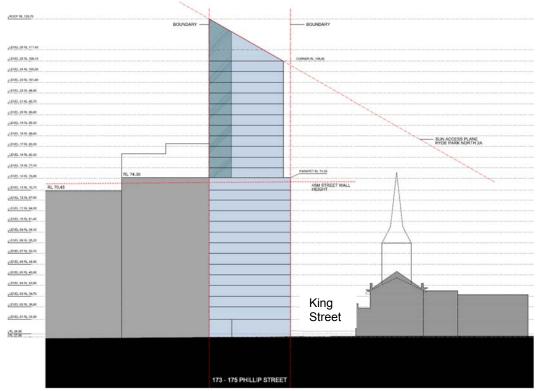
Western (Elizabeth Street) elevation of the proposed envelope.
